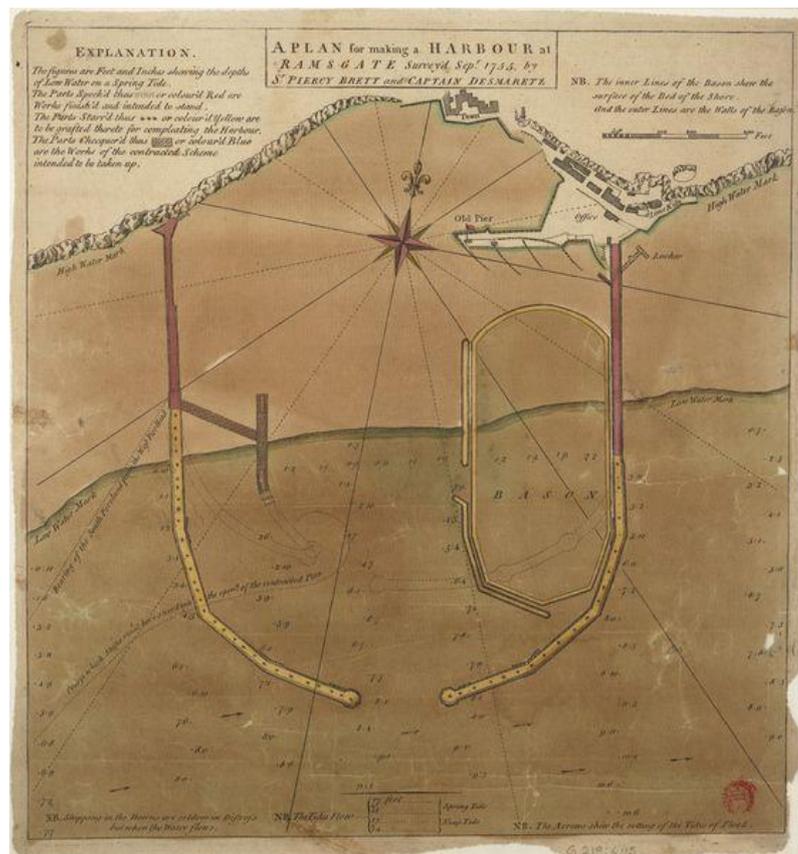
, 1755 plan of the new Ramsgate pier built as a haven of refuge. Note the old timber-built pier within – apparently left until some time around the 1770s. (National Maritime Museum G218:6/13)
